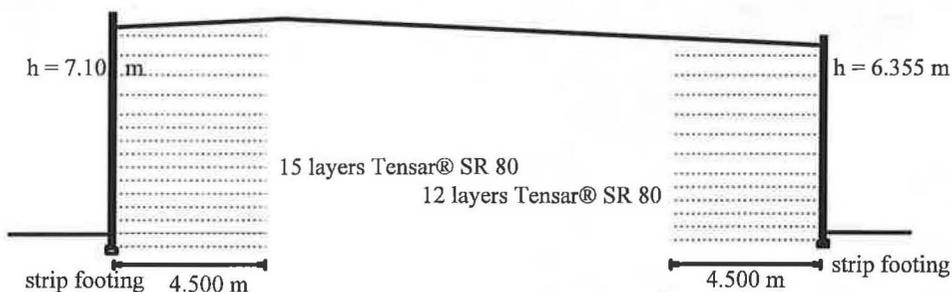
Cross section of the LandShape® reinforced soil retaining walls
